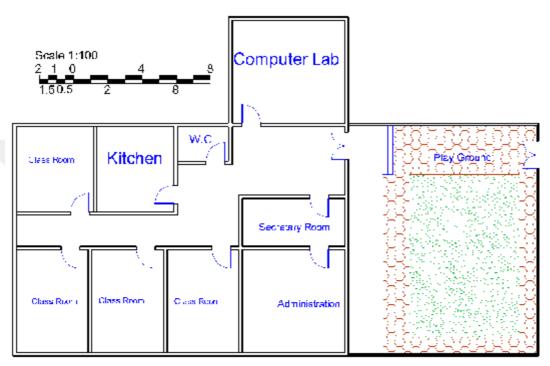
Floor plan of Zlitin A Kindergarten (drawn by author)
